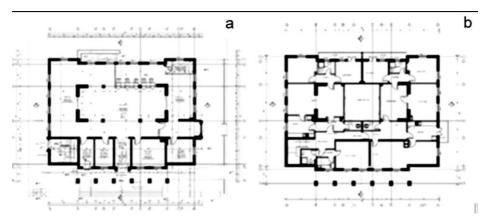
Plans of Merzifon branch building (Archive of Ziraat Bankası).
